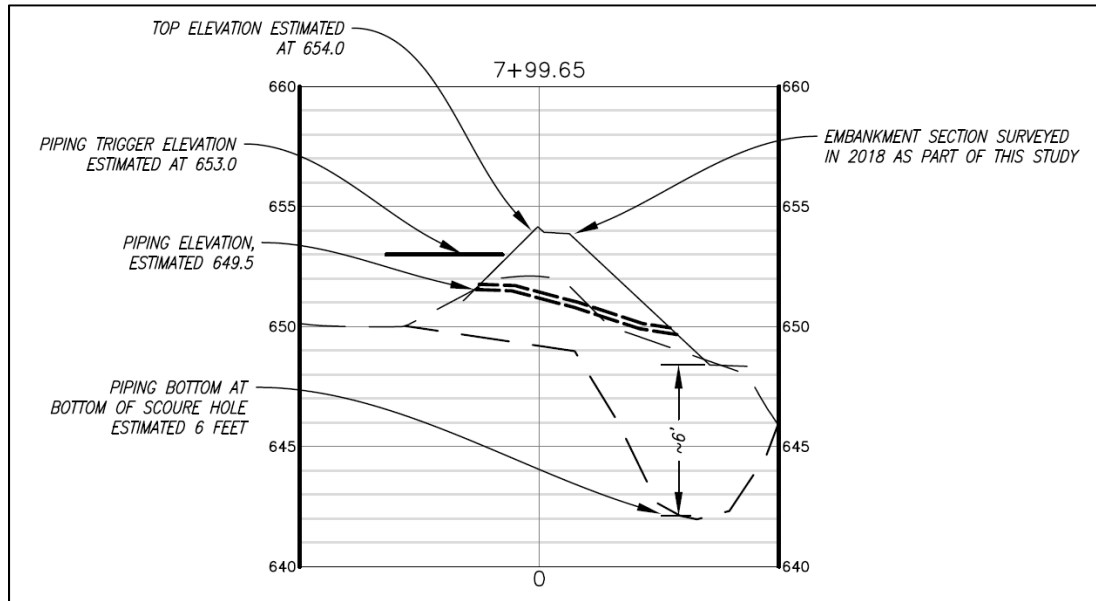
Cross Section of UPRR Embankment and Breach Parameters
